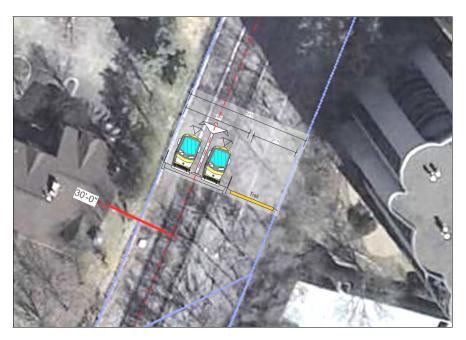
Photograph showing the proposed alignment in the Kenilworth Corridor.
